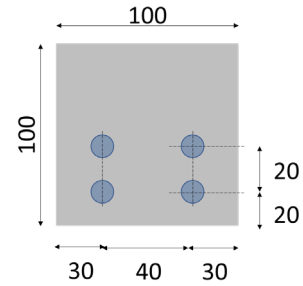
Geometry of the concrete beam cross section with embedded tendons.
